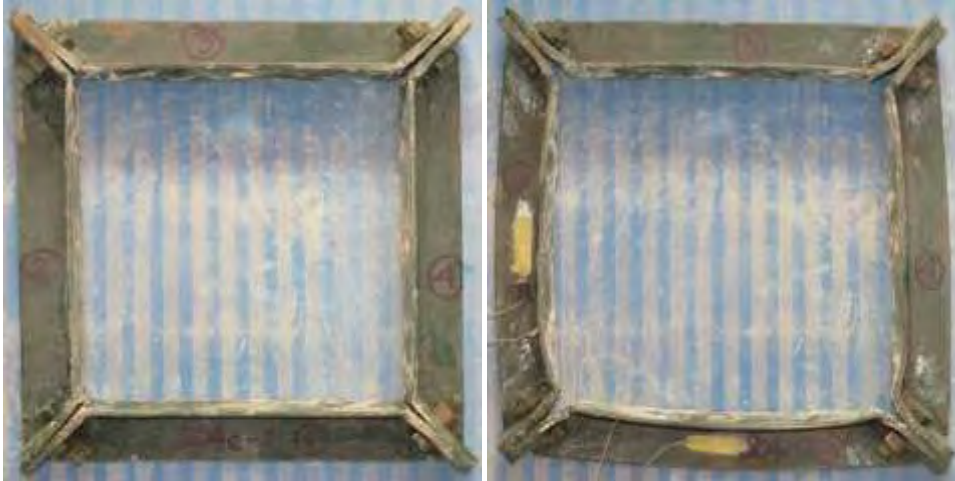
Specimen S04e: (a) side 1; and (b) side 2 after the completion of the test
